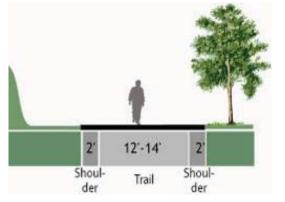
Section 1.3b Improvements to Existing Greenway Trail
